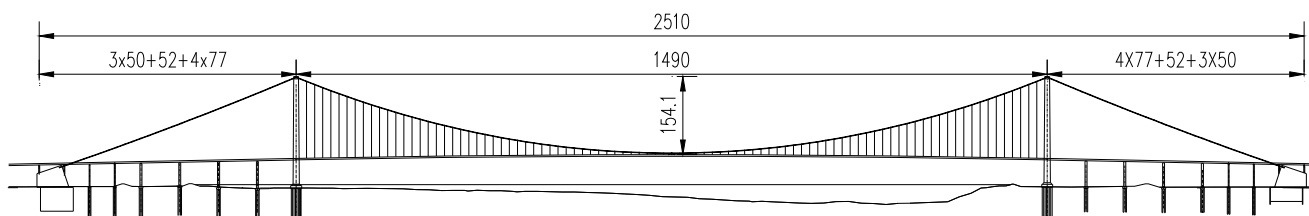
Elevation of the Jiangsu Runyang South Bridge (Dimensions in m)
